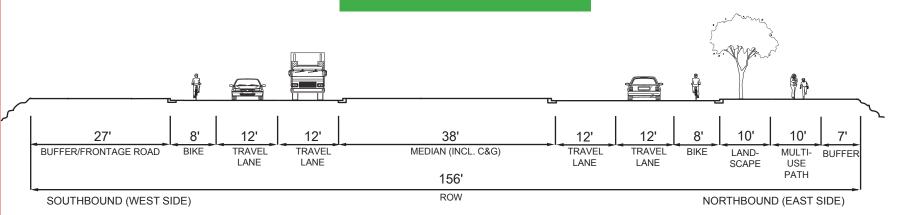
STREET TYPE 7.2 - URBAN BOULEVARD B
